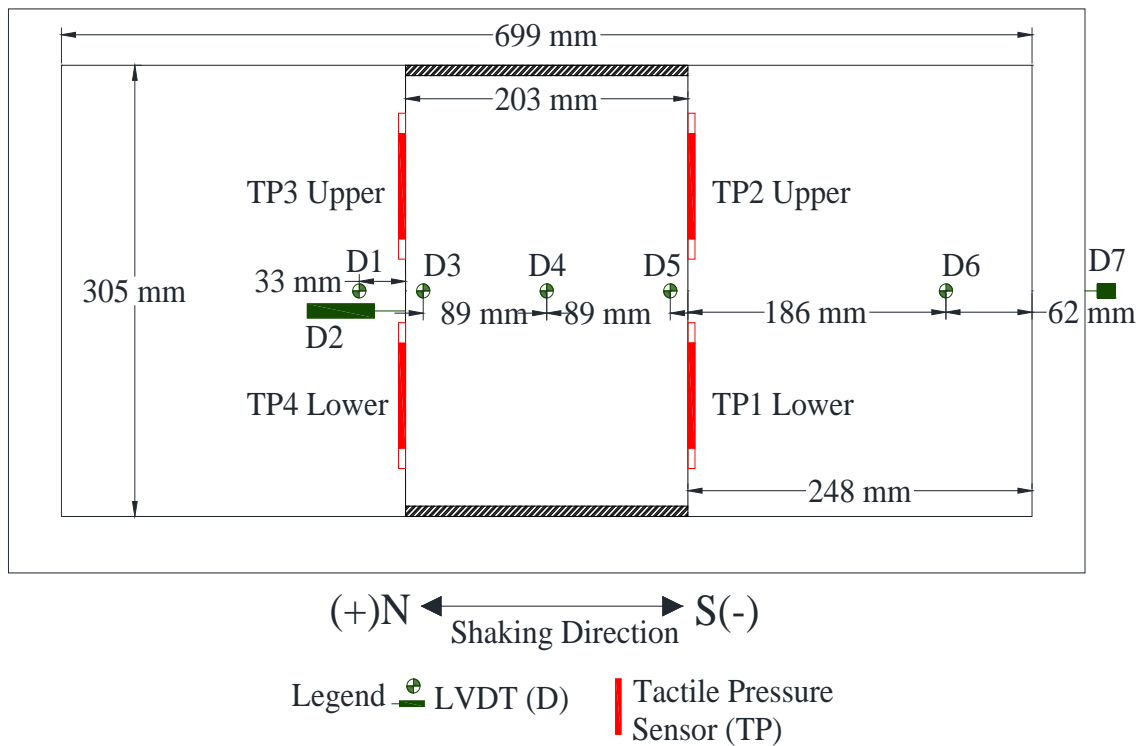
Plan view of Tests 1A, 1B, 3A, 3B, 4A, 4B, and 5.
